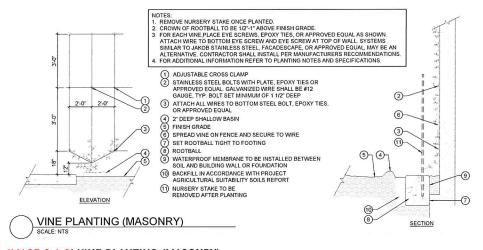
VINE PLANTING (MASONRY)
